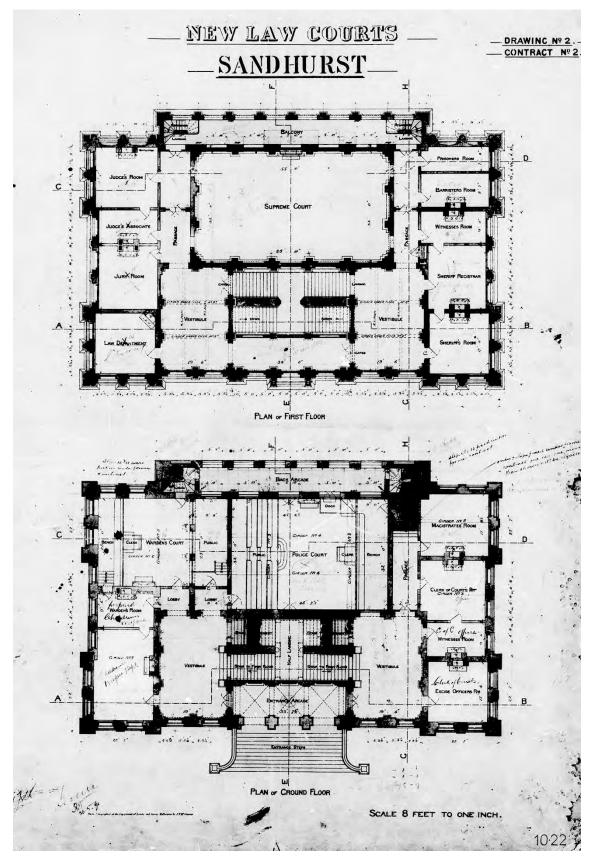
New Law Courts Sandhurst, First Floor and Ground Floor, Drawing No. 2, Contract No. 2 Source: Public Works Department, PROV LCB 10.22
